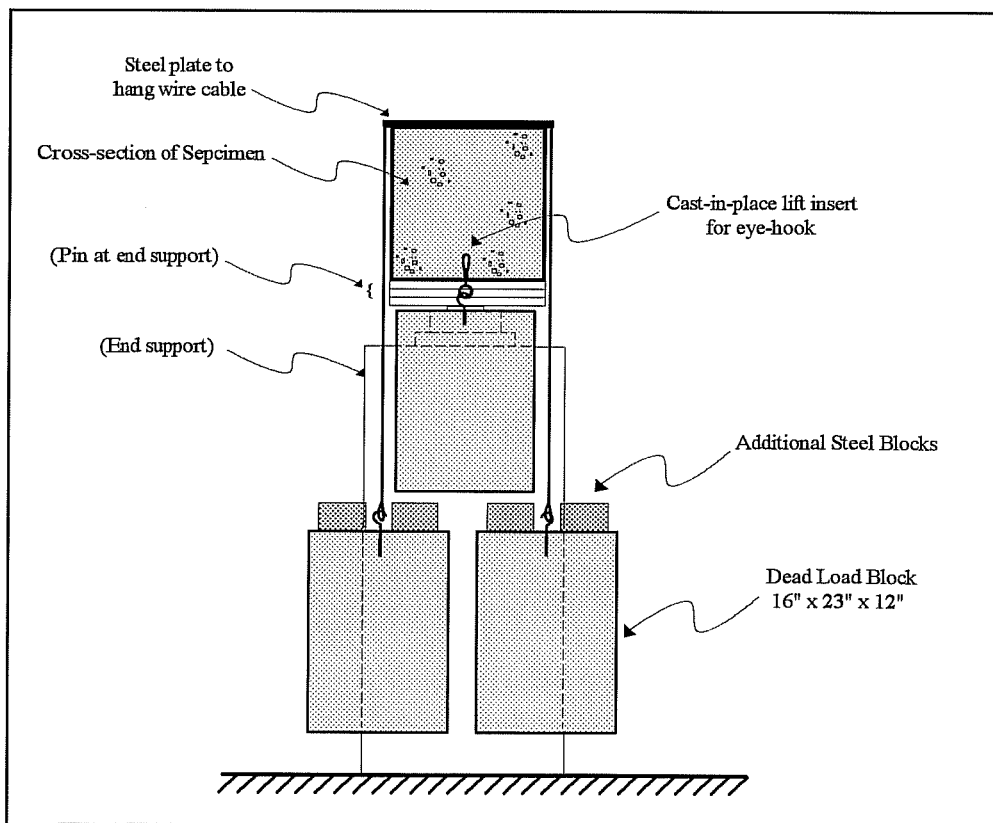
Cross Section of Dead Load Blocks Hanging from Model
